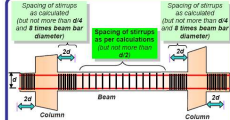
Location and amount of vertical stirrups in beams – IS:13920-1993 limit on maximum spacing ensures good earthquake behaviour.
